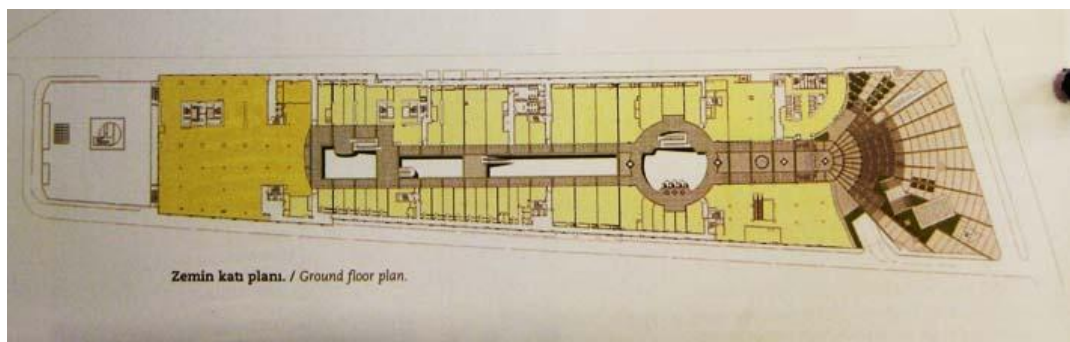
Metrocity Shopping, Office and Residence Complex, shopping mall, floor plan. (Karabey, 2003).
